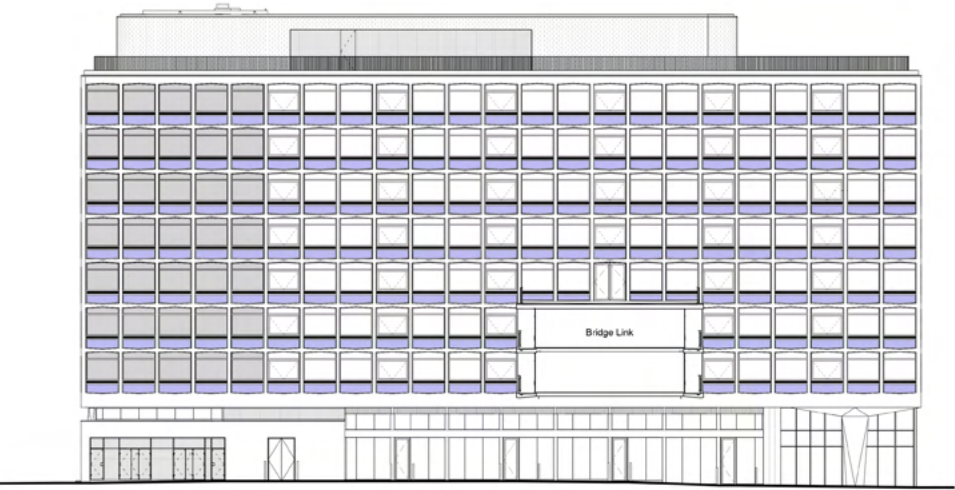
Kingsway East Elevation - MAT 04 location
